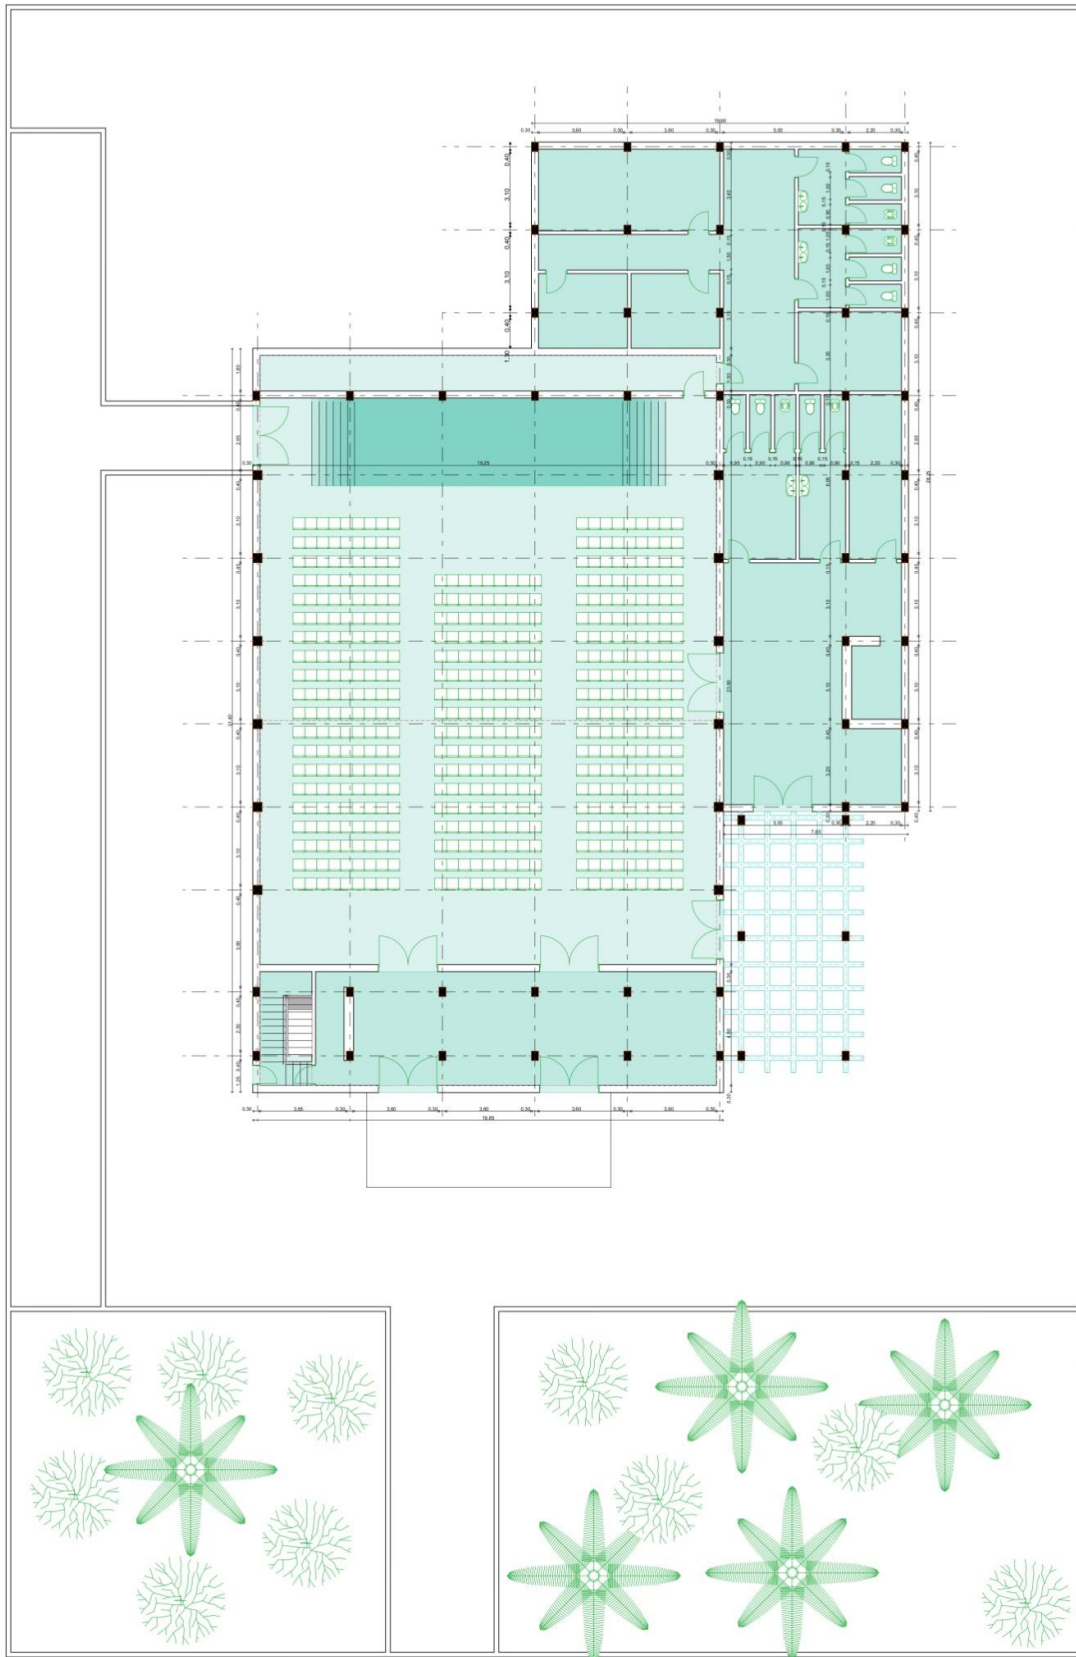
NEBVLA Architectural Renovation Plan (Appendix 10)
